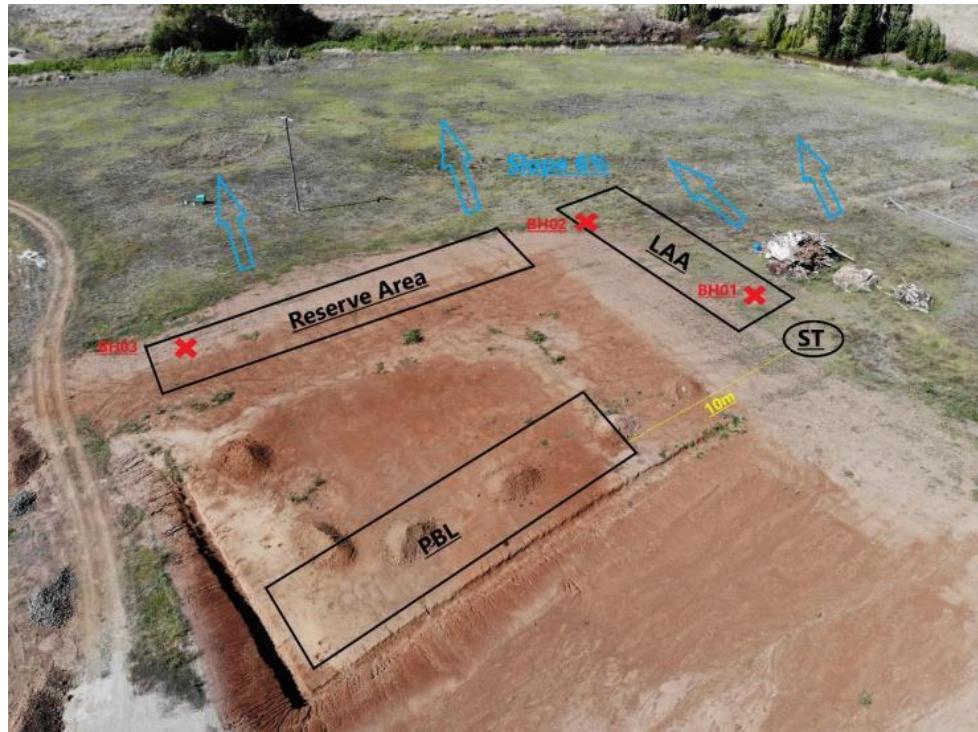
Building and Land Application Area (proposed septic location) (Source: Submitted Geotechnical Report)
